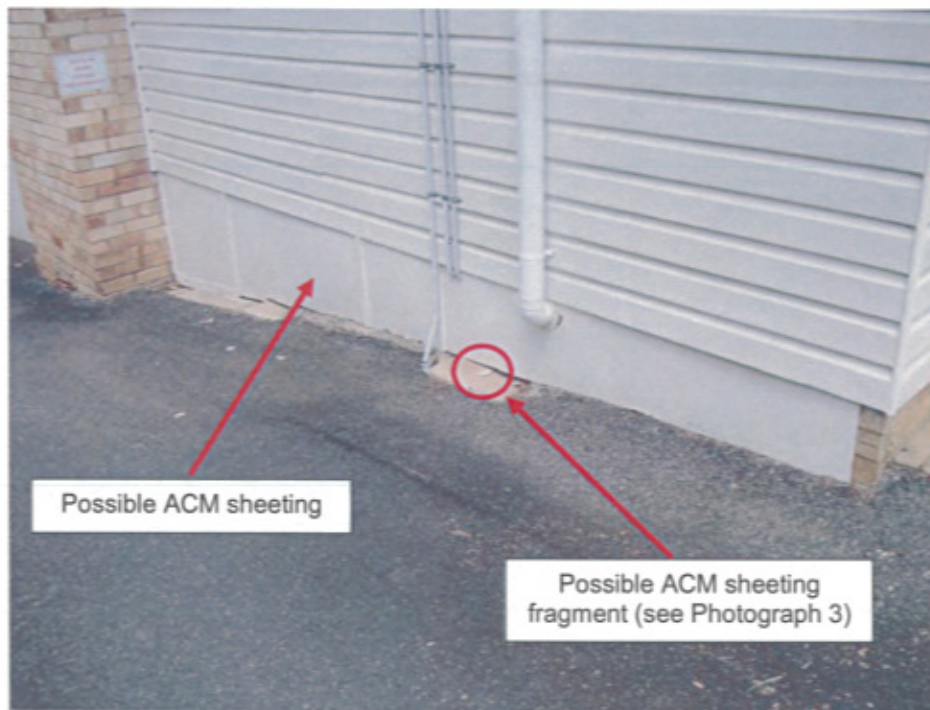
View southwest towards the frontage of 61 Uralba Street
